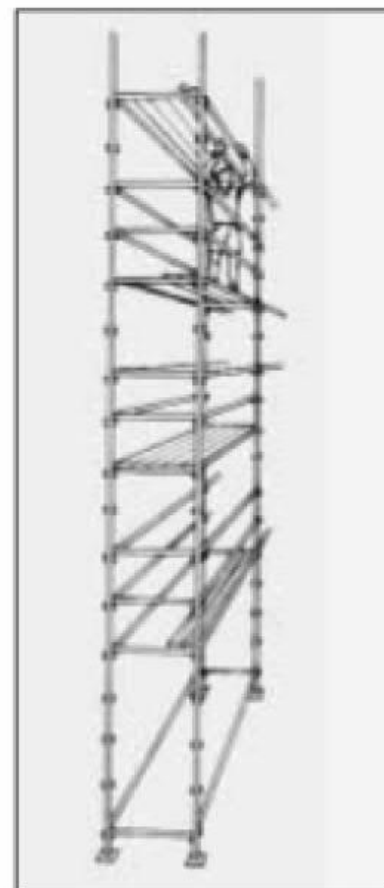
Worker on two planks must have fully decked platform positioned between beneath them at a distance of no more than 2 metres
